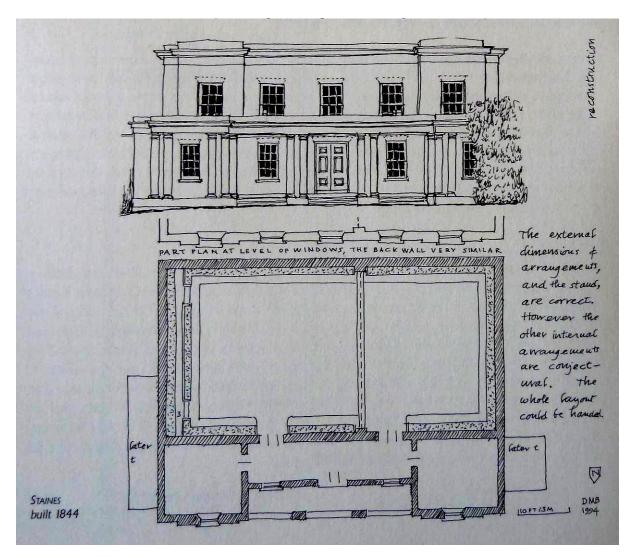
Plan and elevation of the 1844 Staines Meeting House (from Butler Vol. 1, p. 418)
